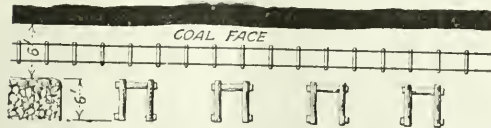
SHOWING TIMBER COGS ON LONGWALL FACE
